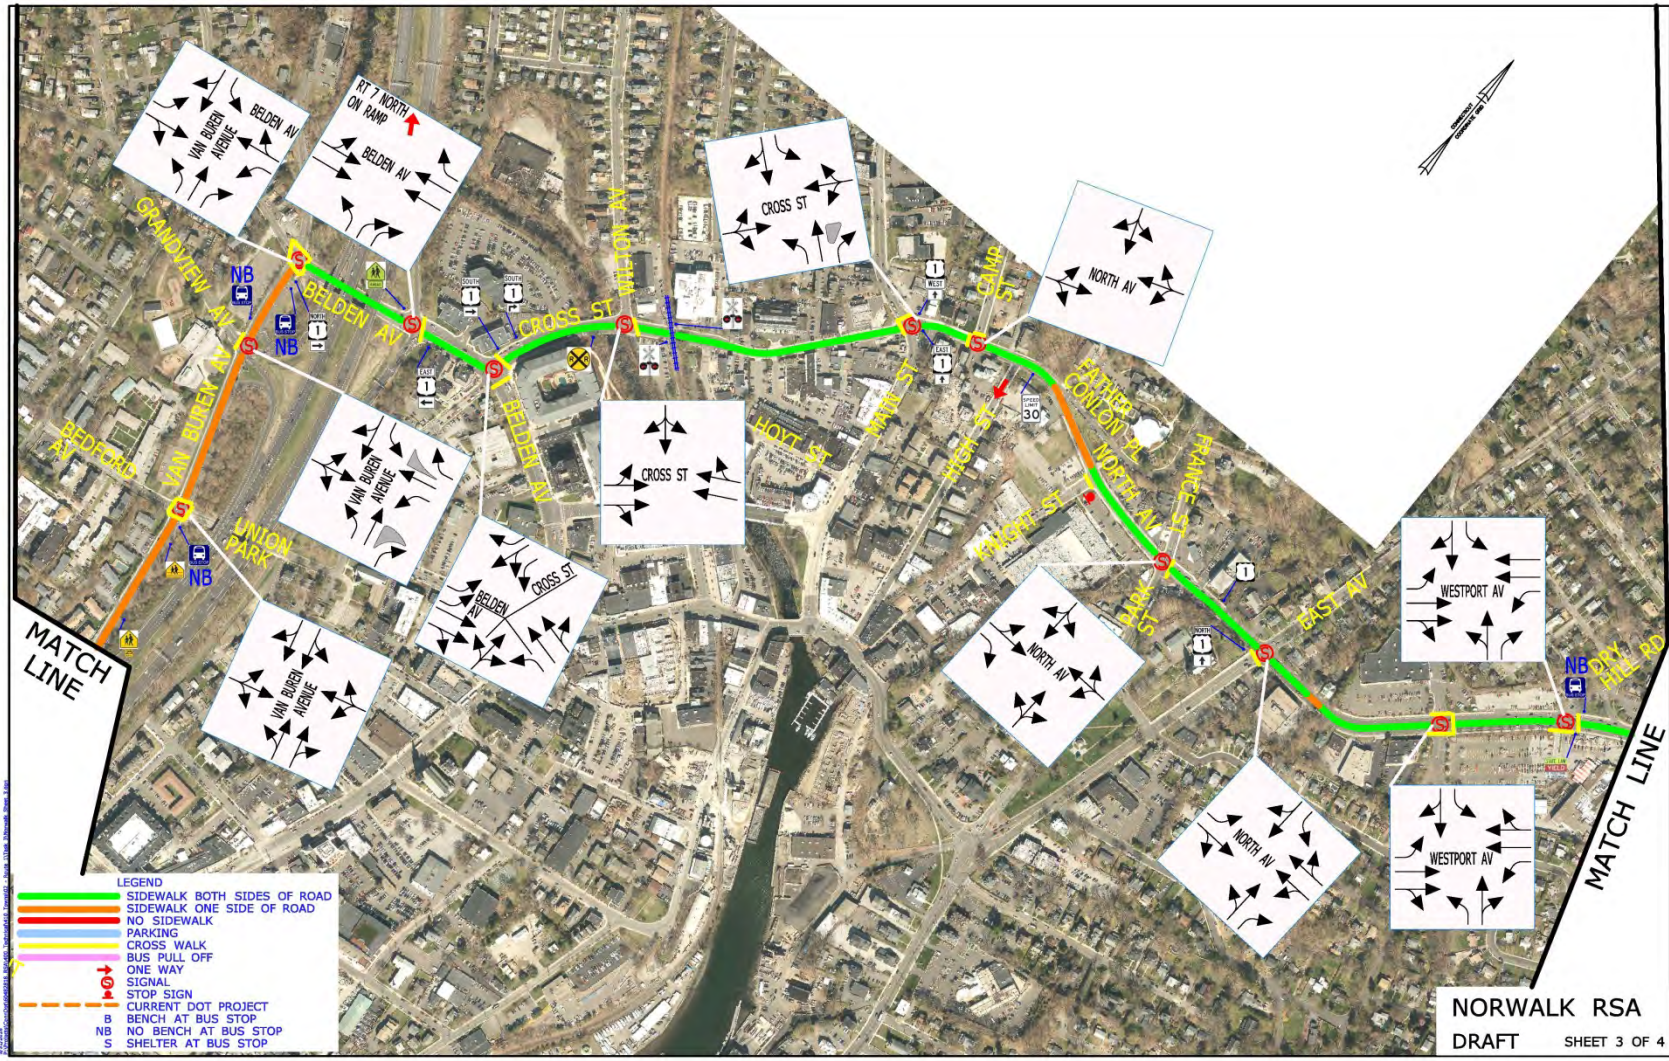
Van Buren Av., Belden Av., Cross St., and North Av., Norwalk Route 1 - Road Geometrics
